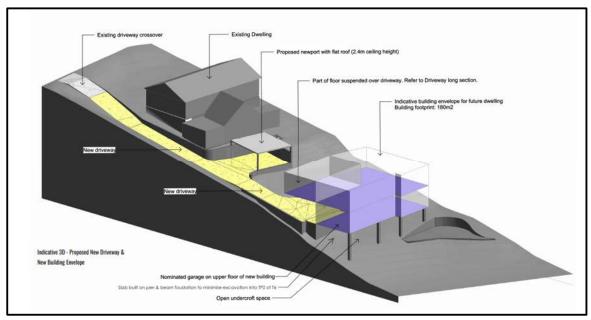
3D view of subdivided land with concept building envelope and driveway to Proposed Lot 2
